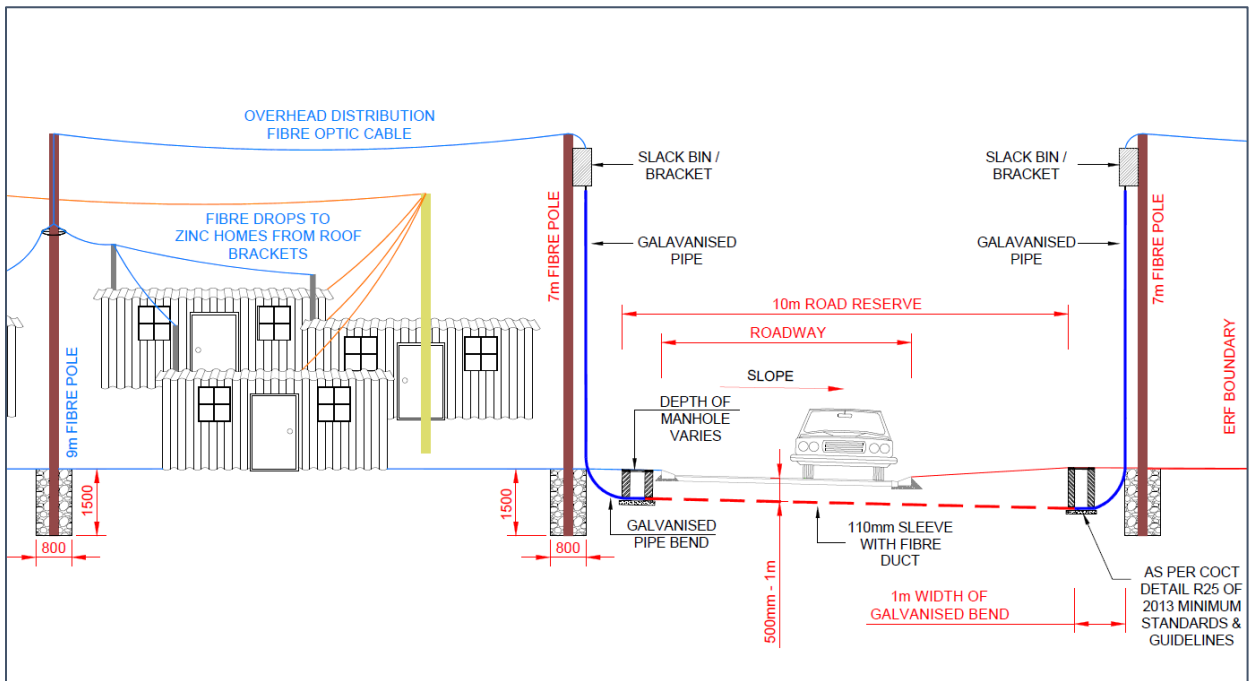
Typical Aerial Fibre to Underground Transition for Road Crossings
